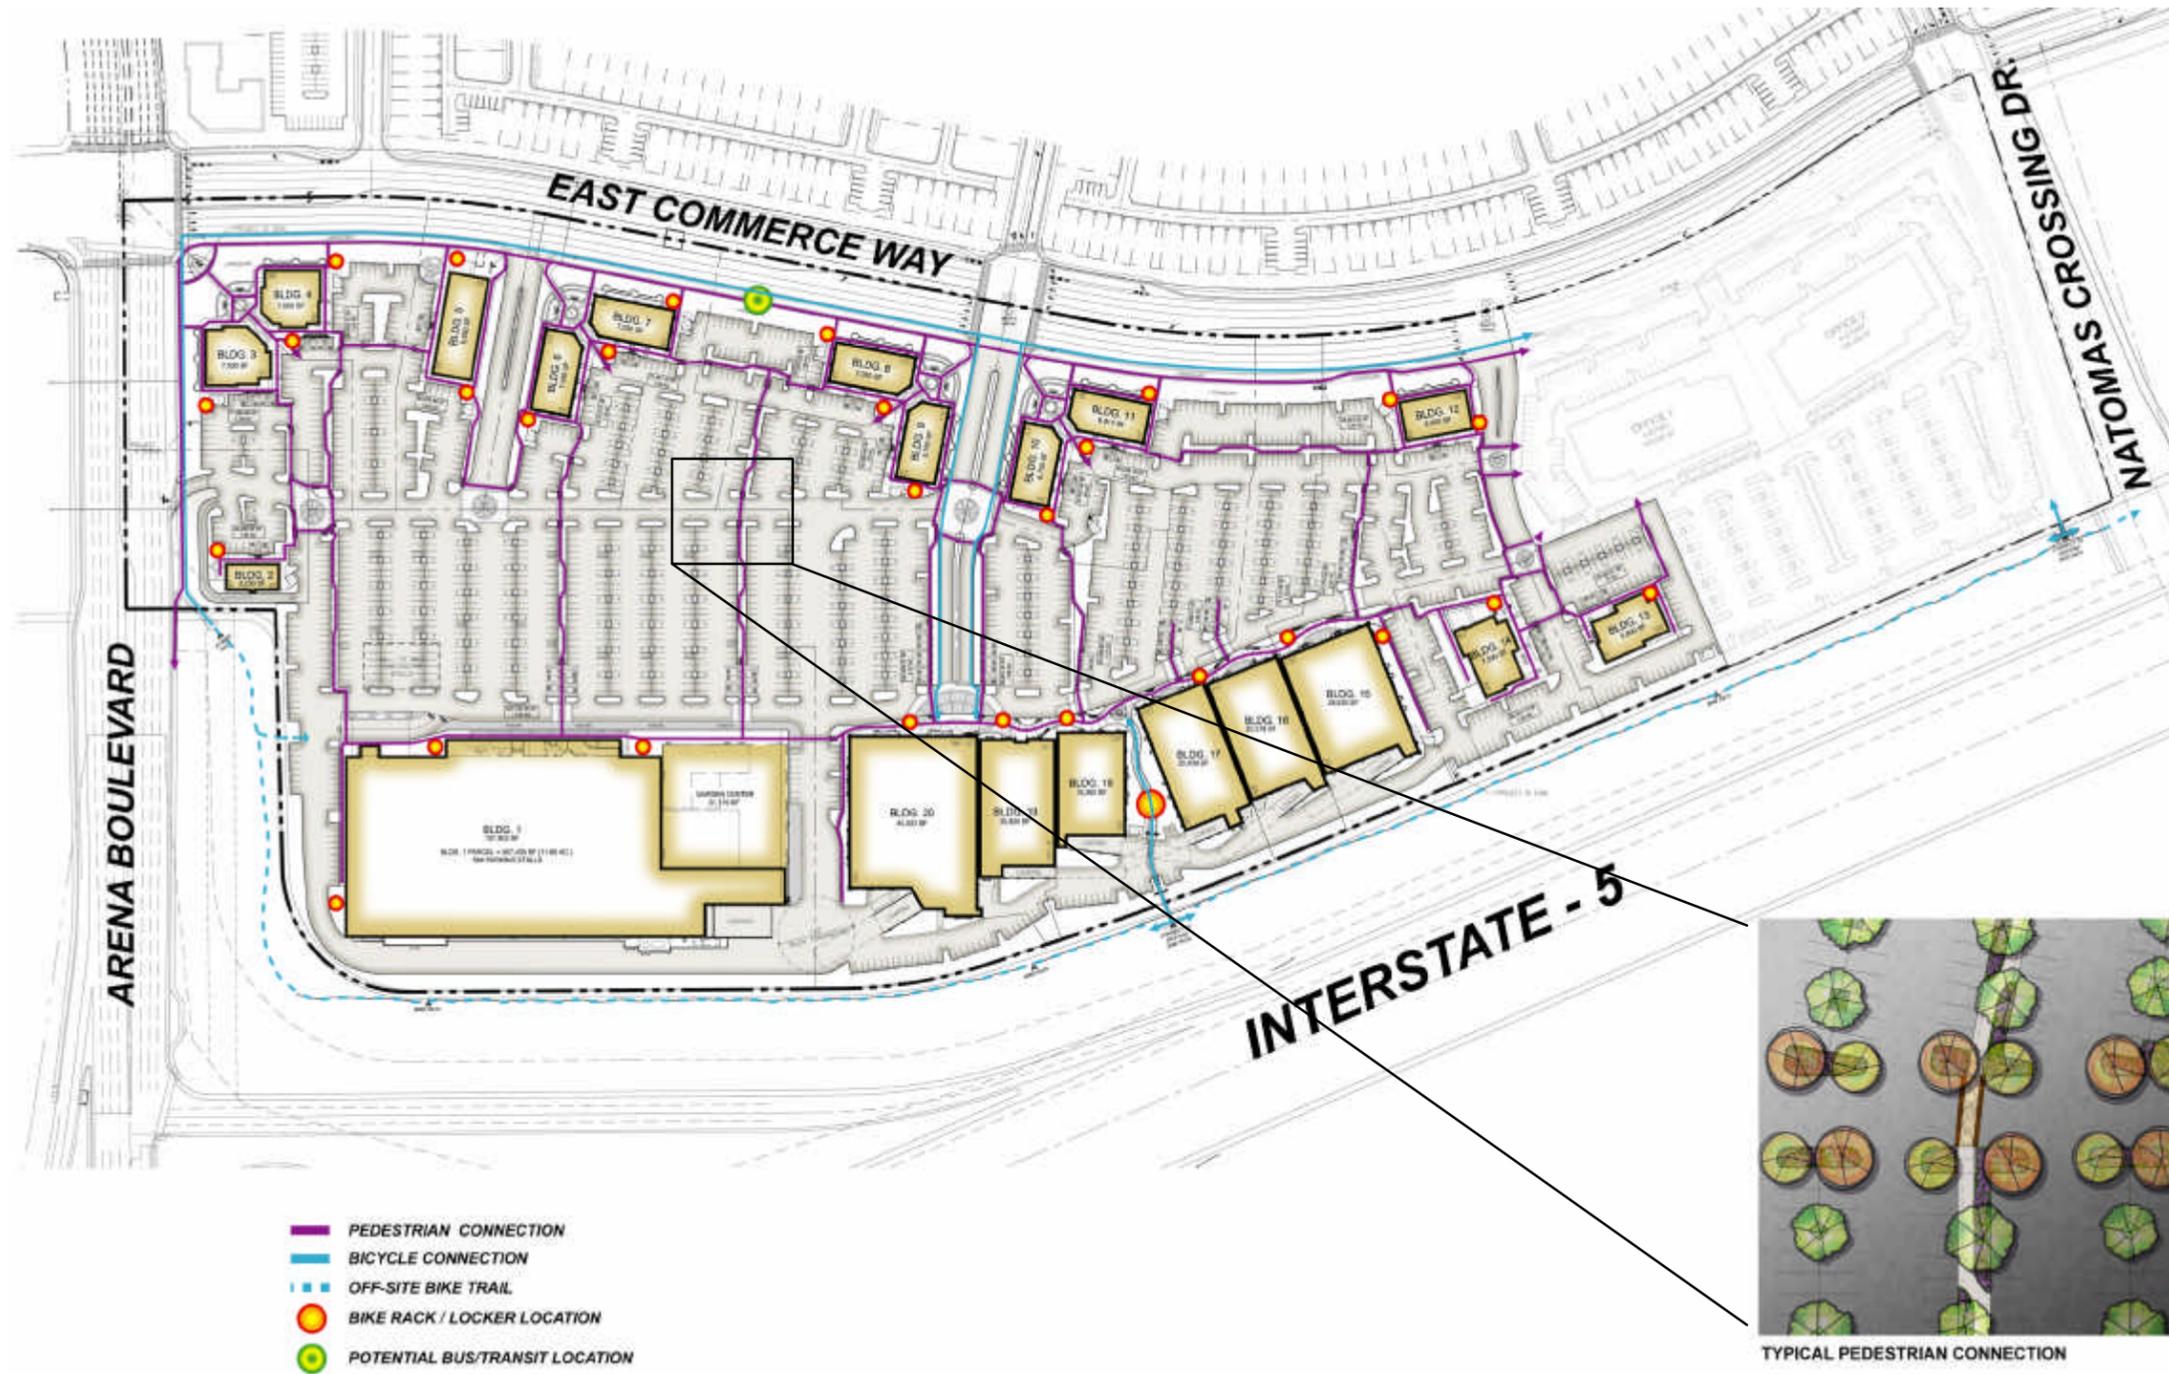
(d)-1 - Connectivity Plan (NTS)
